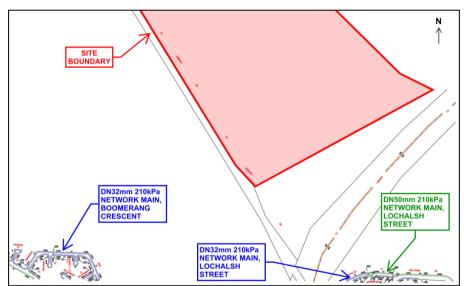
Jemena Asset Plan South (Source: Jemena Gas)
